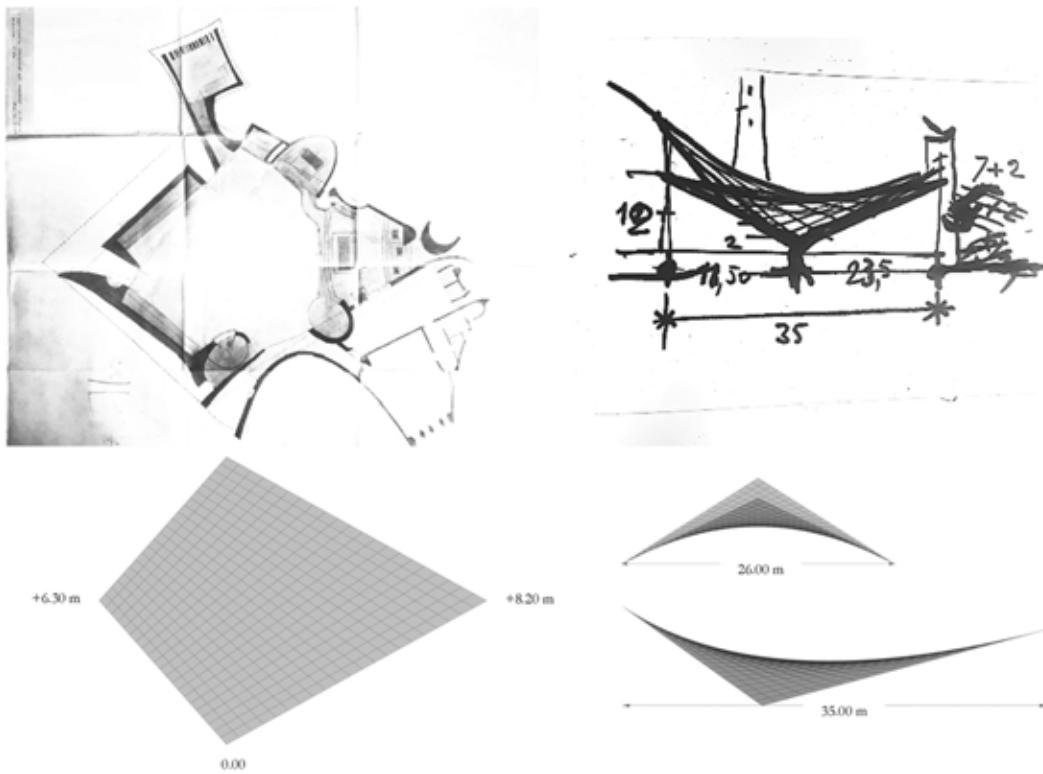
Plan and sketch of the Zogno church, 1961 (courtesy of Laura Sonzogni) and 3D sketch of the hypar geometry
